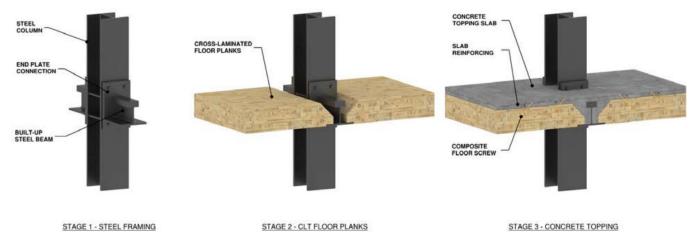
AISC Steel-Timber system construction stages (Credit: AISC, 2017)
